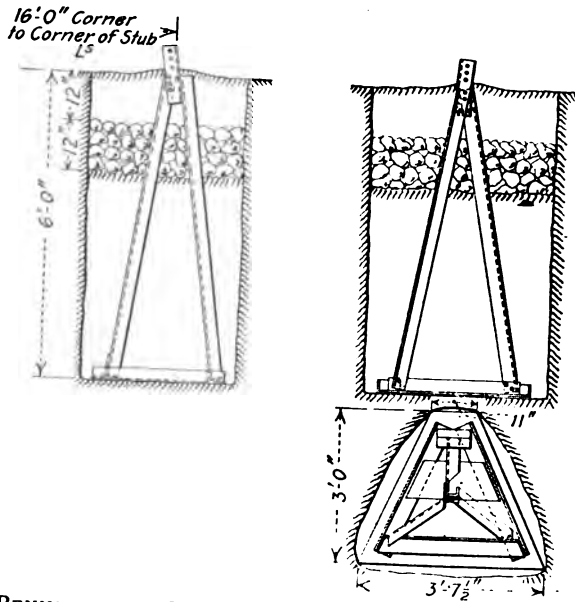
PENNSYLVANIA WATER AND POWER CO. FOUNDATION FOR 40-FT. LIGHT SECTION TOWERS
